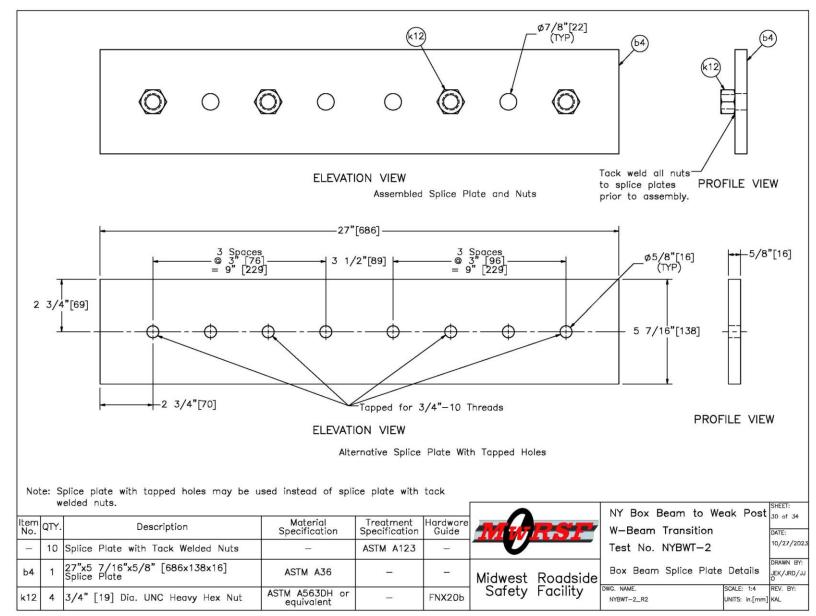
Box Beam Splice Plate Details, Test No. NYBWT-2
